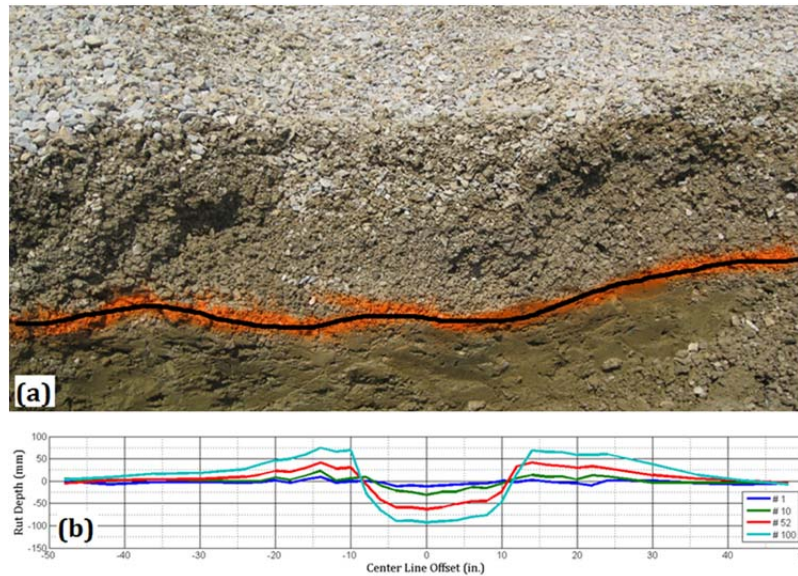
(a) Excavated trench and (b) surface rut profile of the 12-in.-thick crushed limestone section in Cell 2 (1 in. = 25.4 mm).
